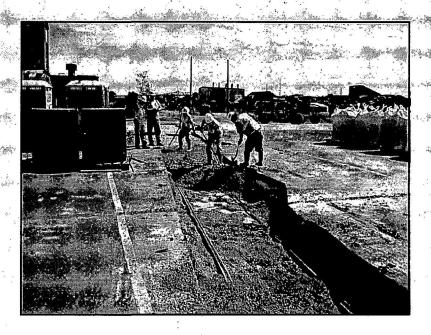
Installation of electrical pull box associated with the hydraulic control wells located south-east of HCTS building.
